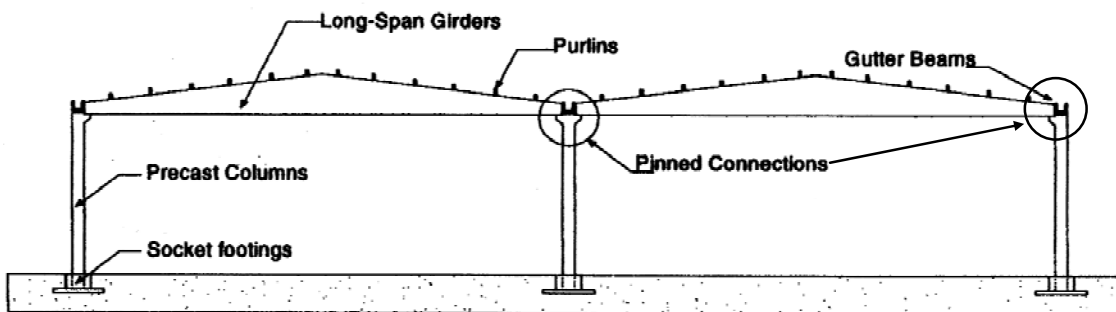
Elevation of a Typical Precast Concrete Building (Posada, 2001)
